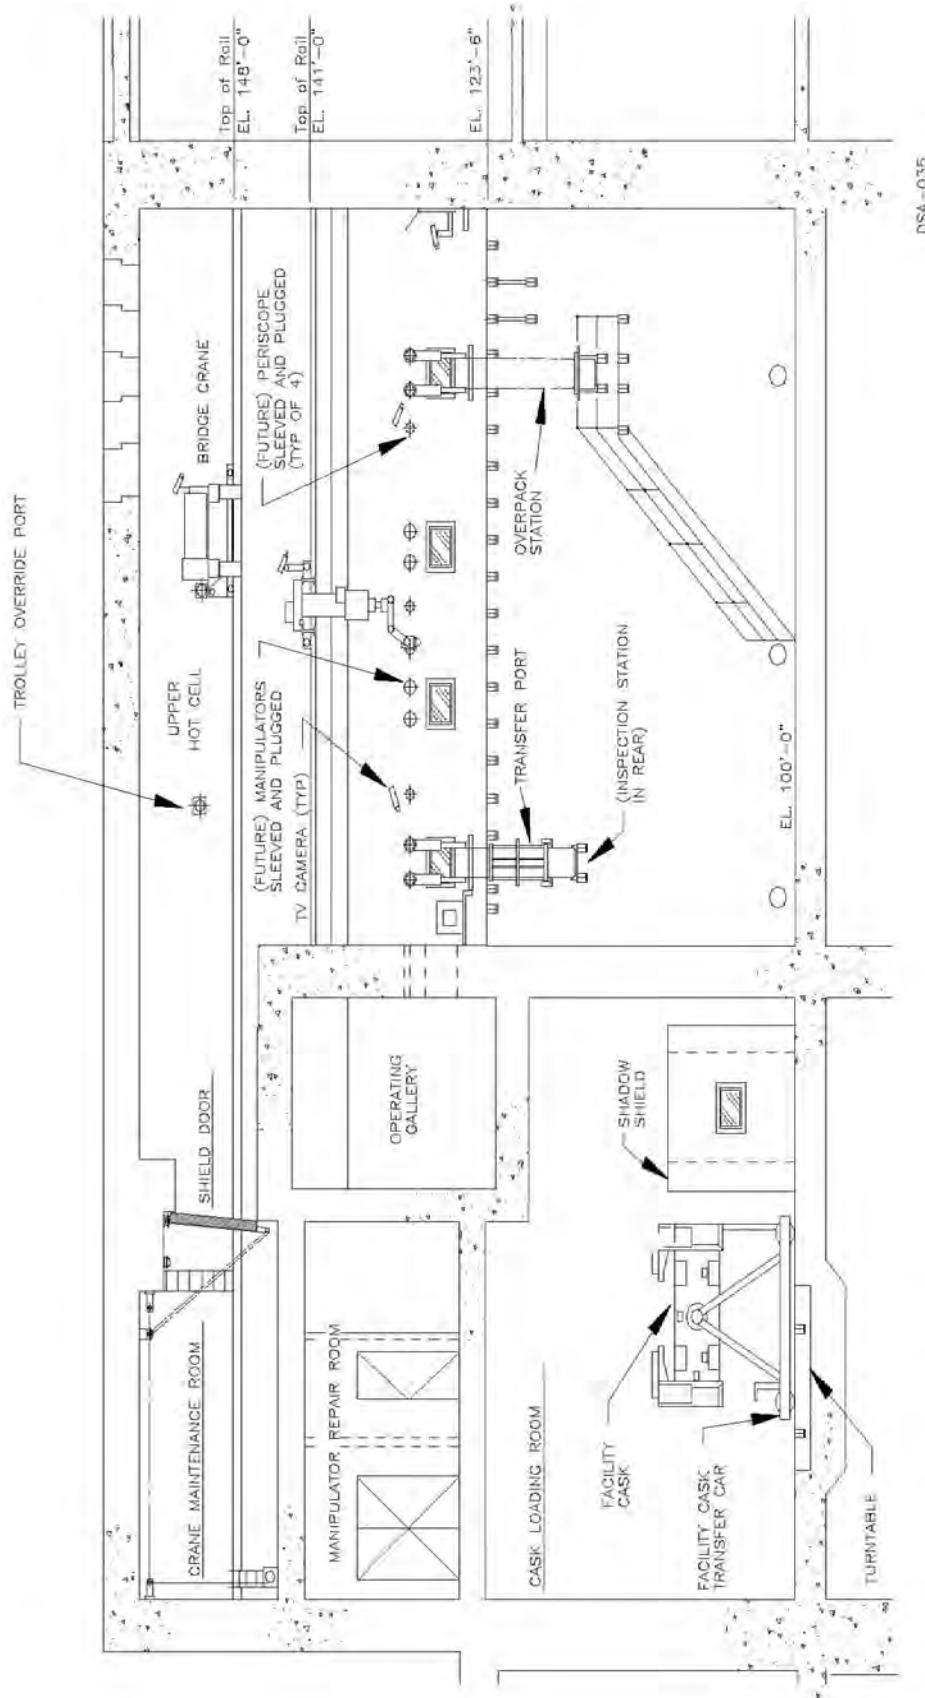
Details of Upper Hot Cell Complex at Cross Section D-D
